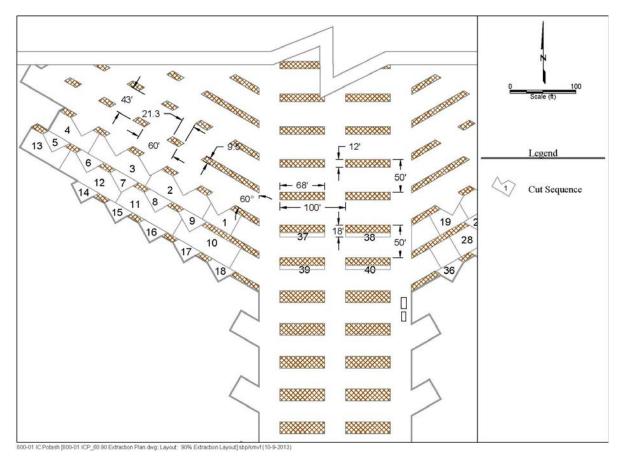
Pillar Dimensions for 90% Extraction Plan
